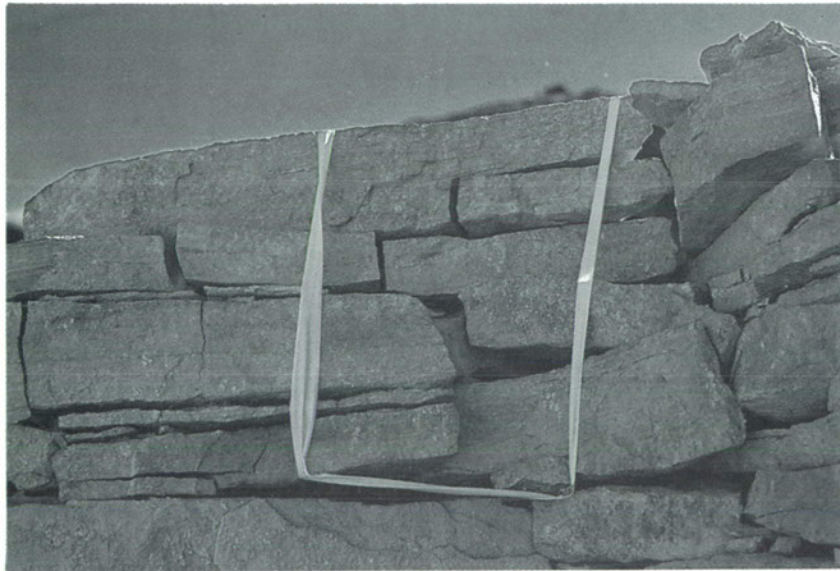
The south wall of Structure 2 before stabilization with a soil epoxy mortar.
